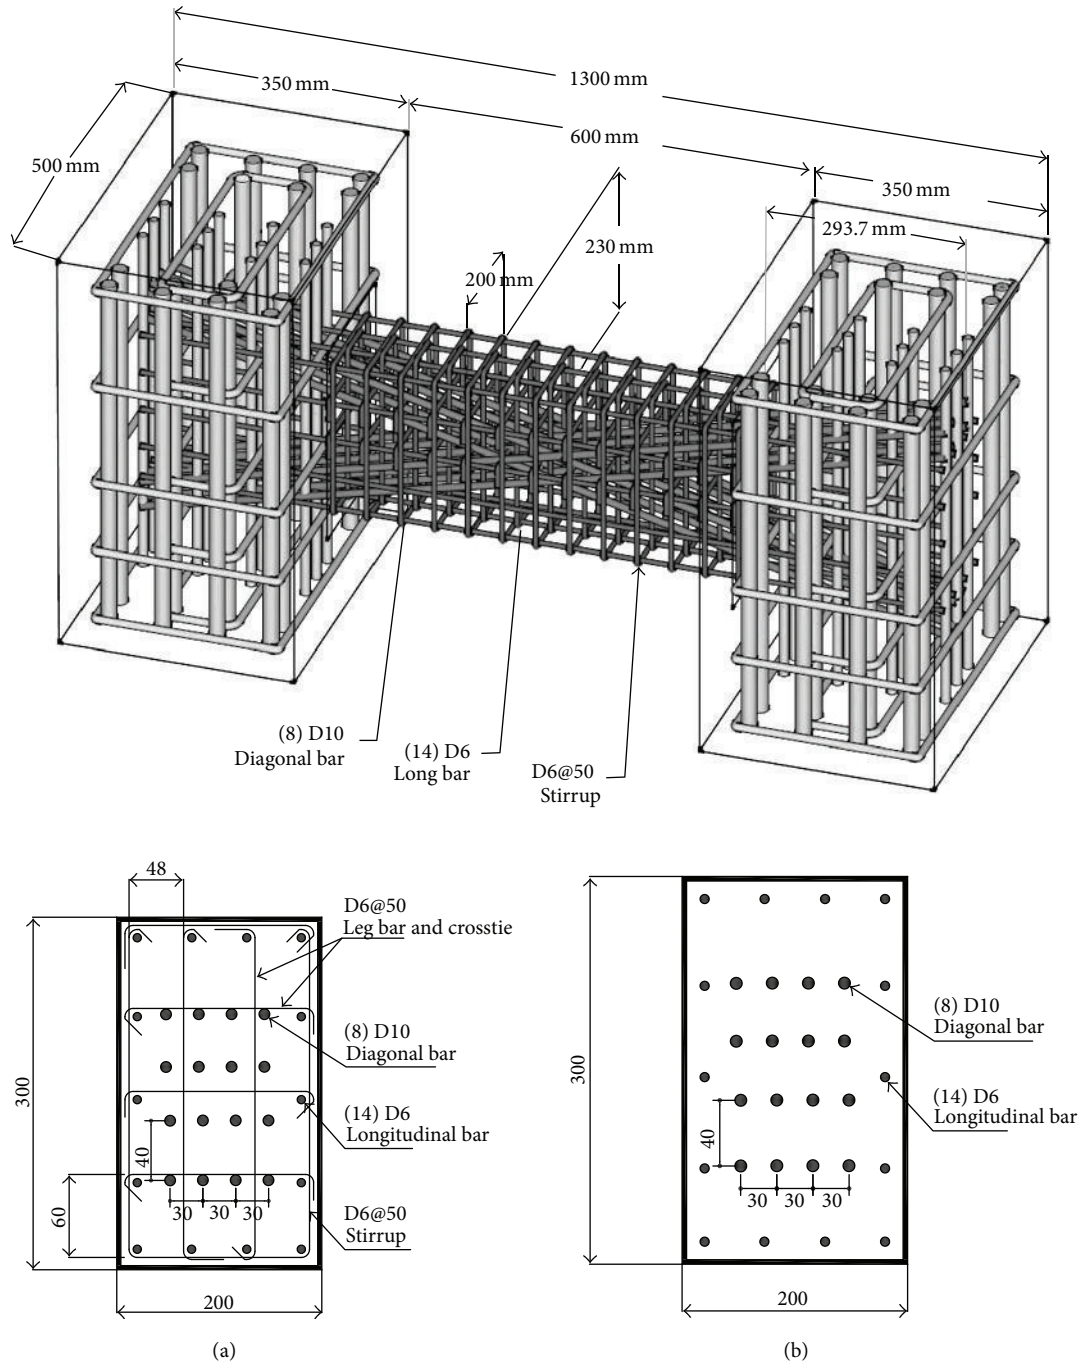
Details of diagonally reinforced coupling beams. (a) CCB specimen. (b) SFRCCB specimen.
